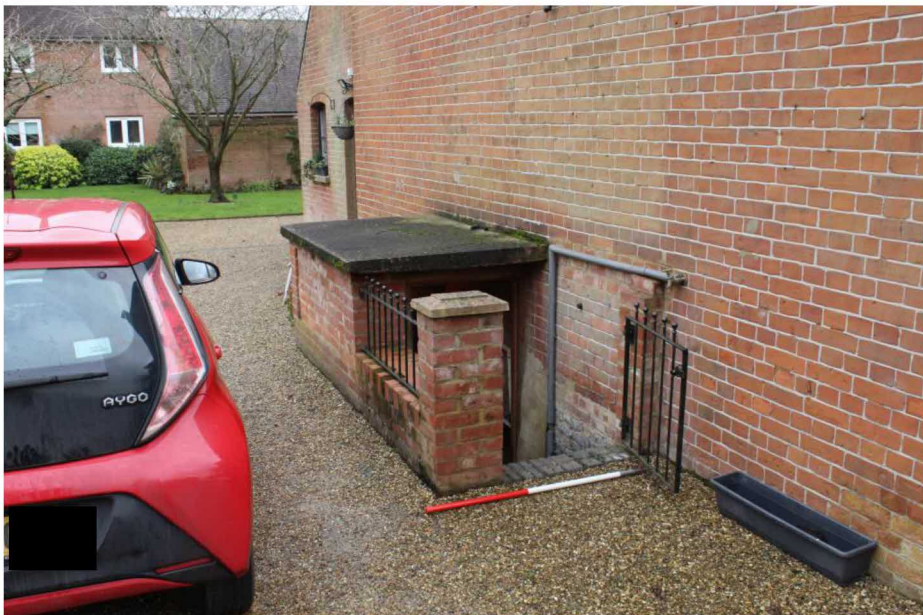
Detail of access into basement on northern elevation. Photograph taken facing south-east.
